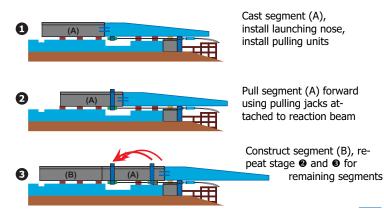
Typical Incremental Launch Bridge Construction Cycle (VSL Systems)
